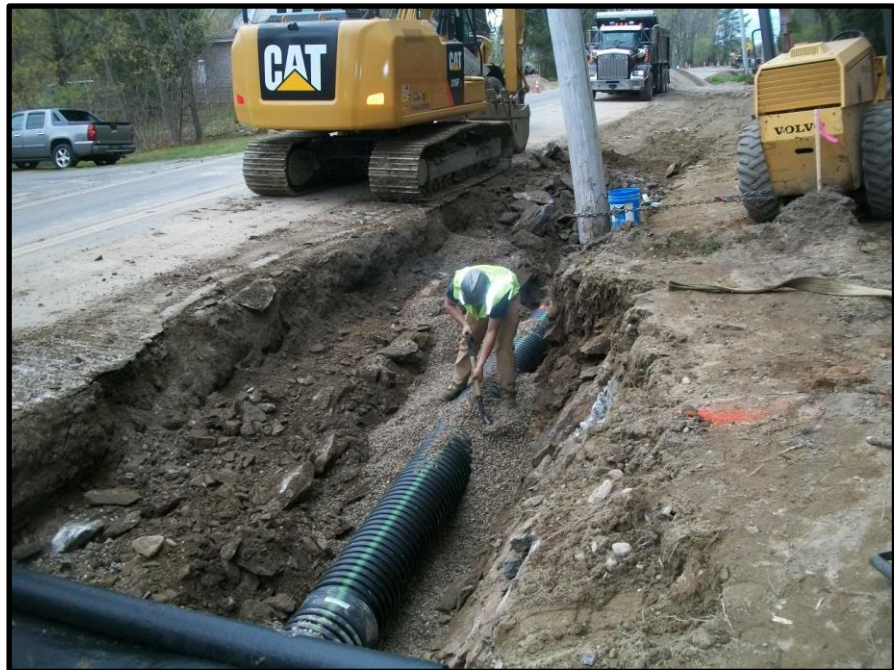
Installation of 15-inch underdrain upstream of CB-7E.
